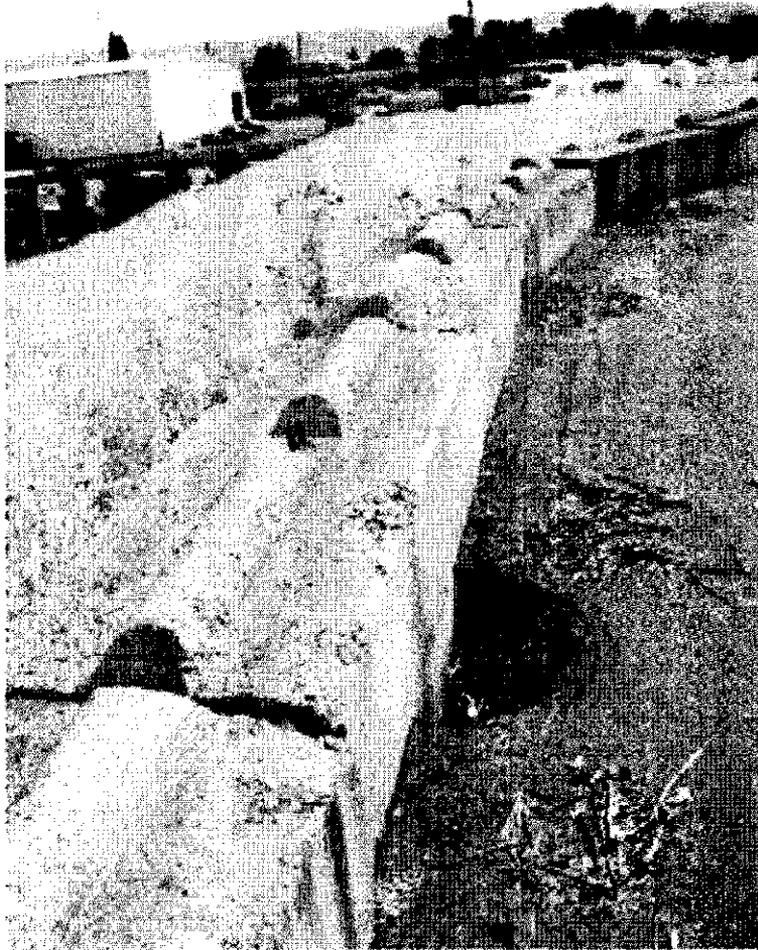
Small Pavement Failure in Waste Pile Access Road
